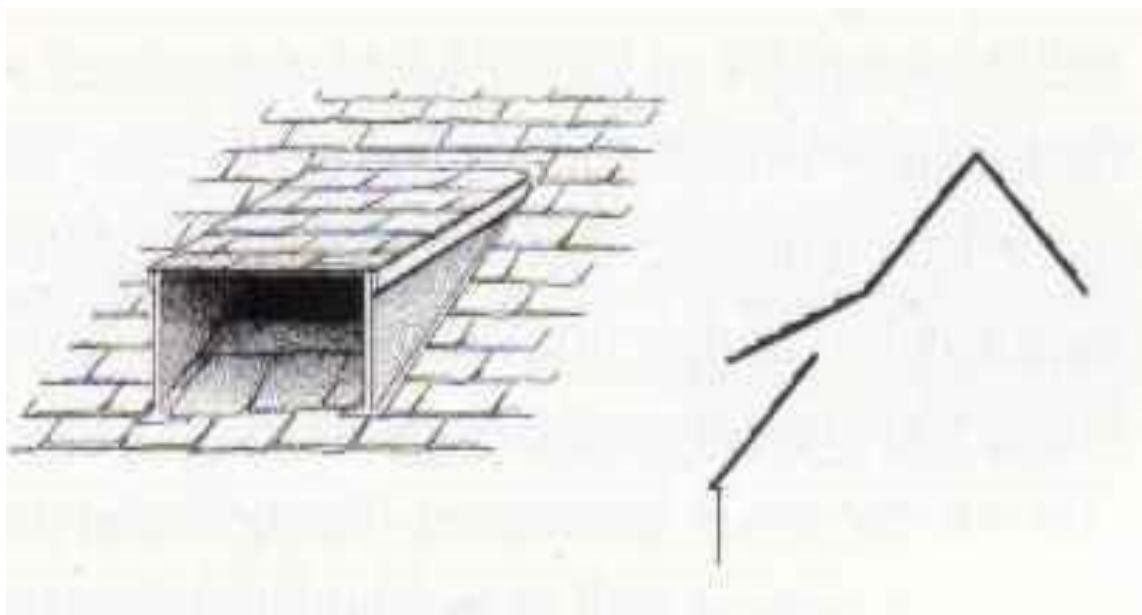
Proposed new bat roof entrance at site of damaged tiling
